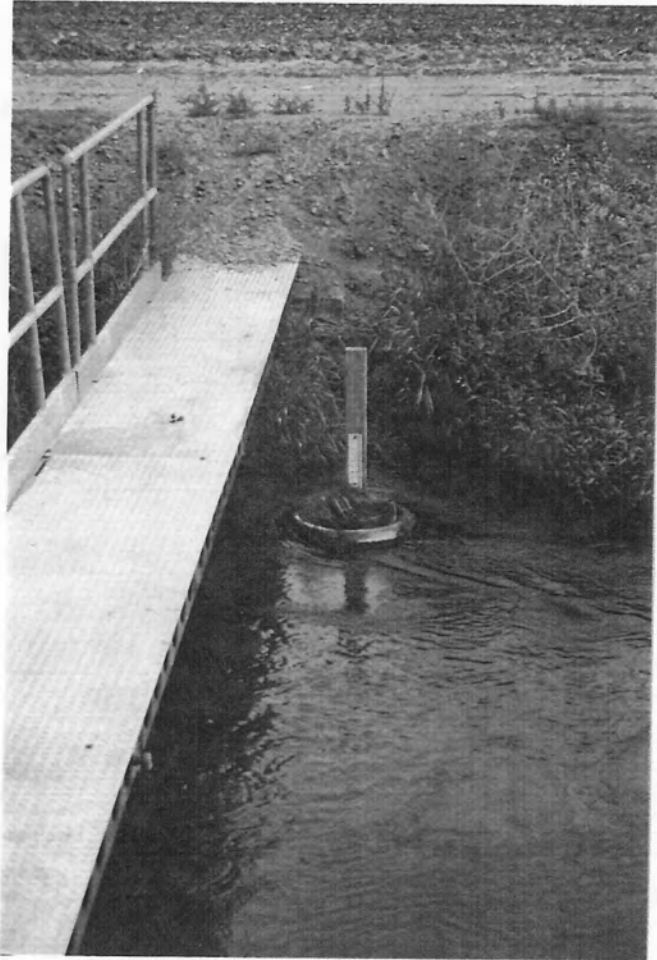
A closeup view of a rating bridge and staff gage in a stilling well.
